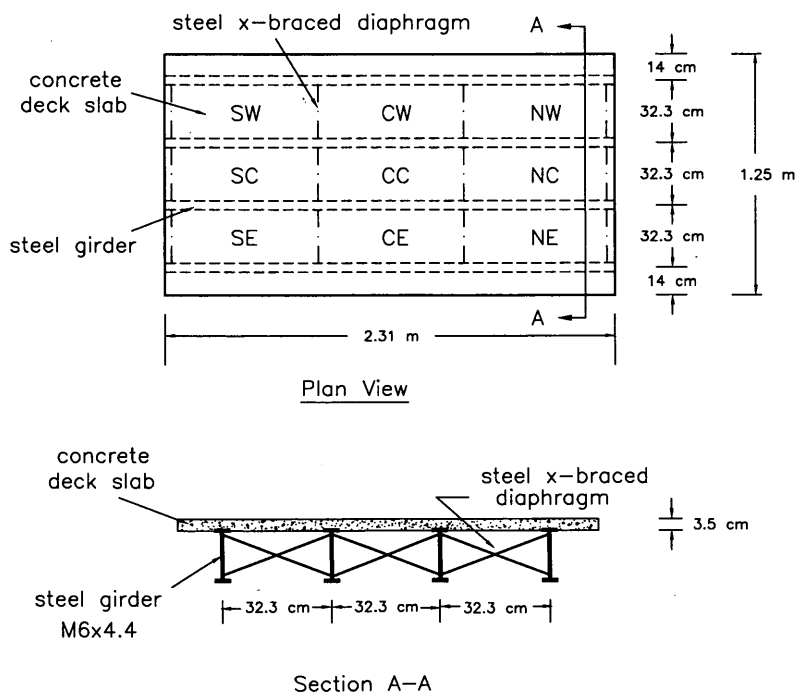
Dimensions of the 1/6.6-scale bridge deck model with a prototype girder spacing of 2.13 m (1 m = 3.28 ft and 1 cm = 0.394 in.).
